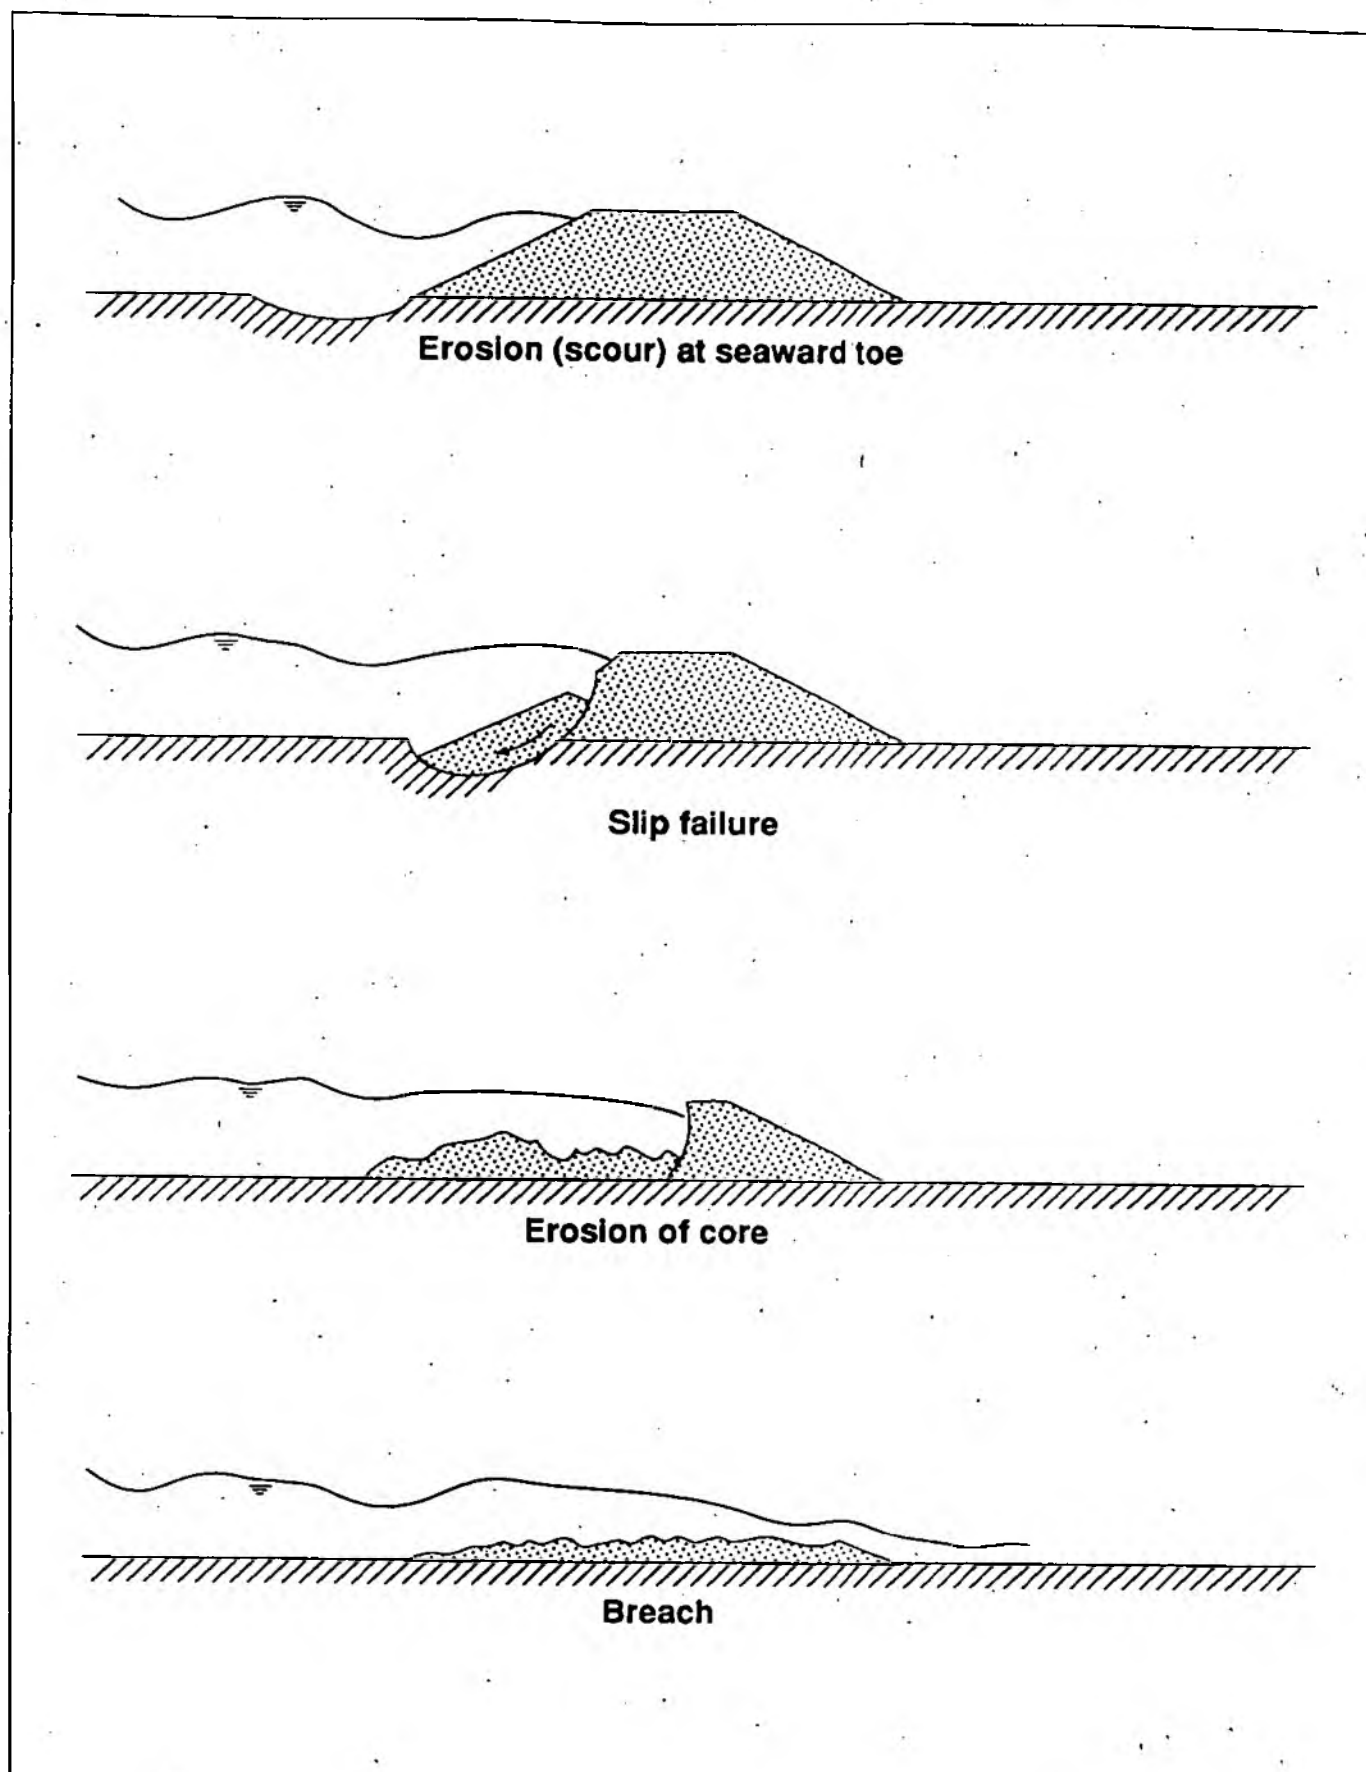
Illustrations of failure modes for an earth flood embankment (cont'd)
